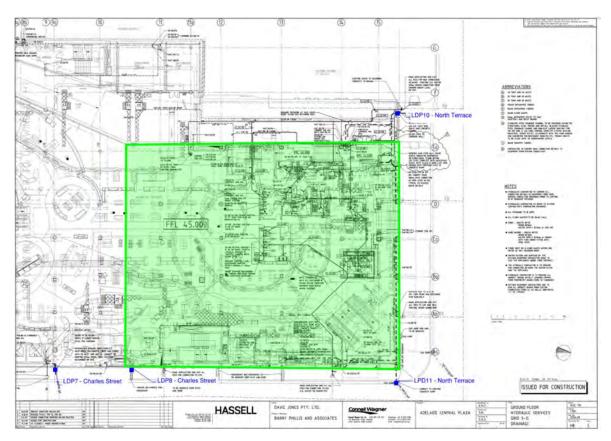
IFC Hydraulic Drawing with Existing LPD Locations Markup – Northern Portion of the Retail Building (Site is within the Green Shaded Area)
